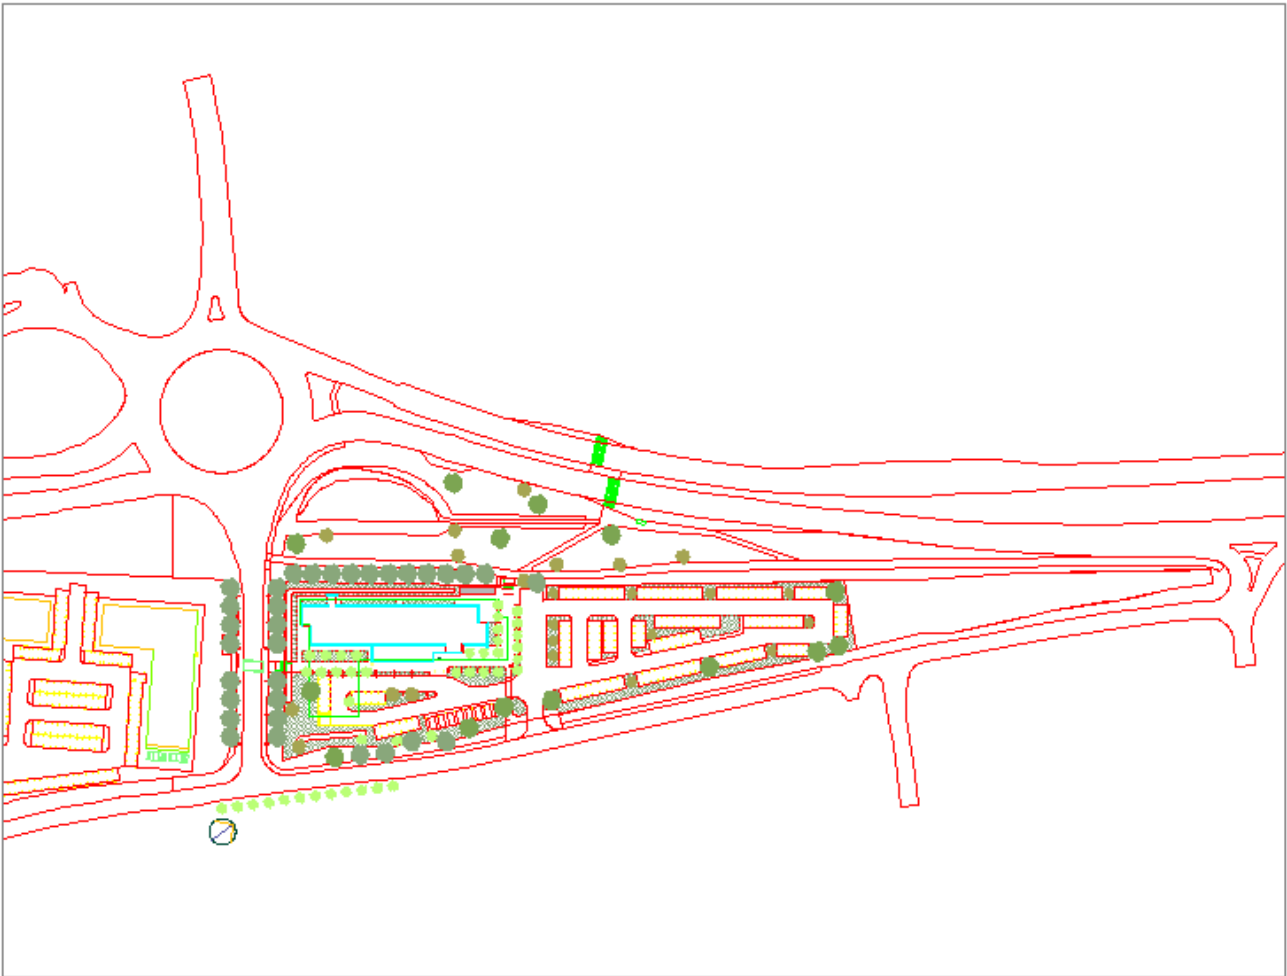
Proposed Site Plan by NORR Consultants Ltd
